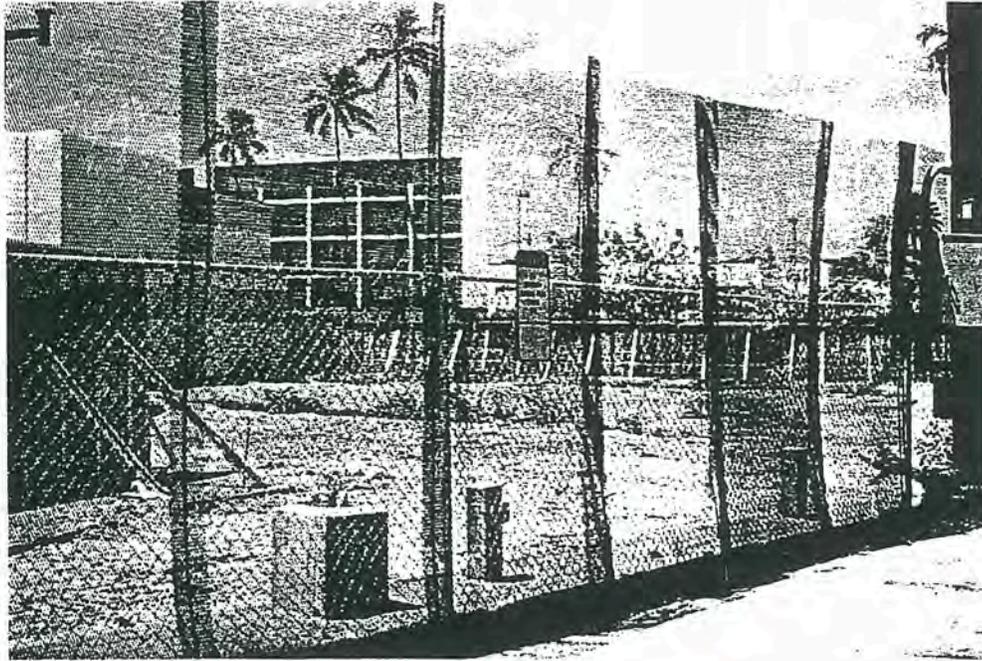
Empty lot (TMK 2-6-18:36) at south corner of project area; view south
